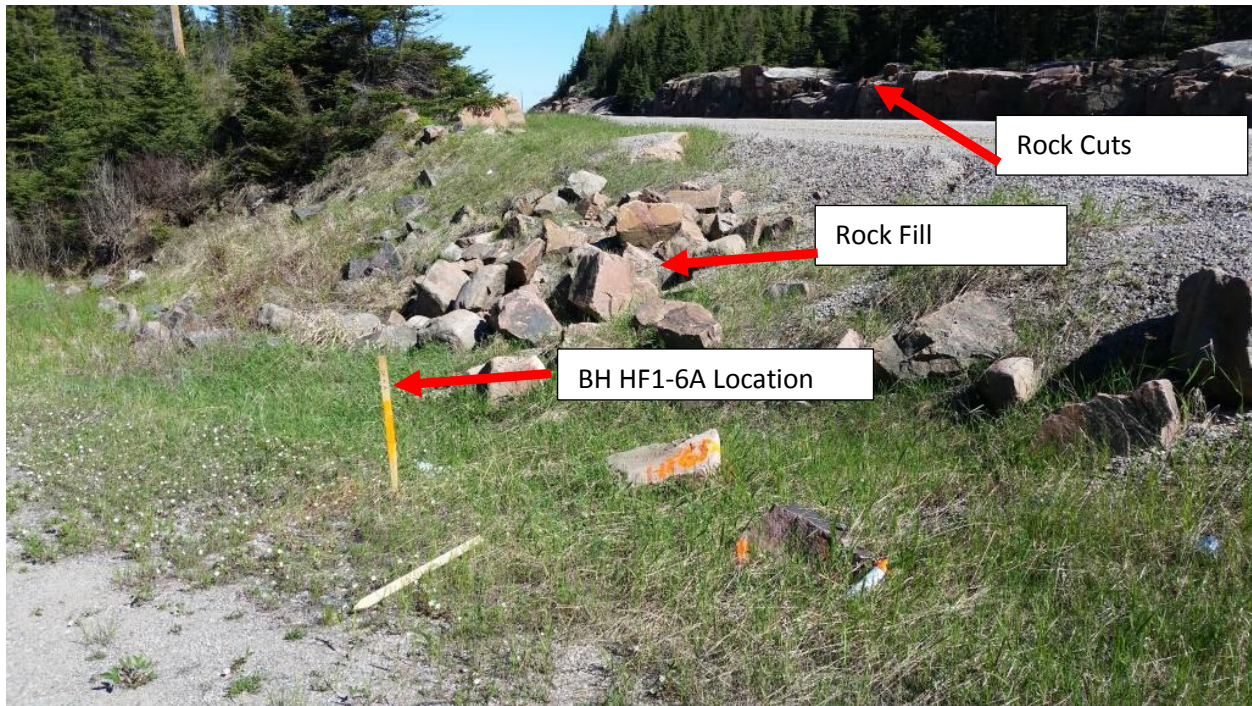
Facing towards East - Rock Fill, Rock Cuts and BH HF1-6A (June 2017)
